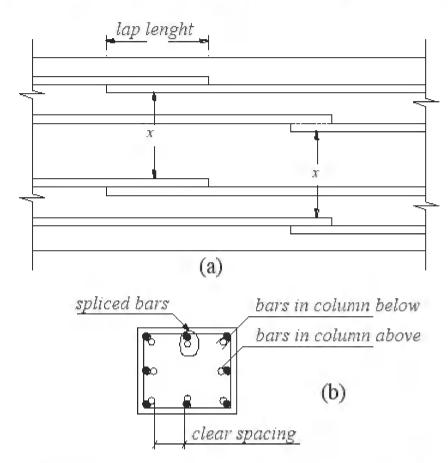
(a) Lap splice of slab and wall reinforcement; (b) lap splices of column and beam reinforcement
